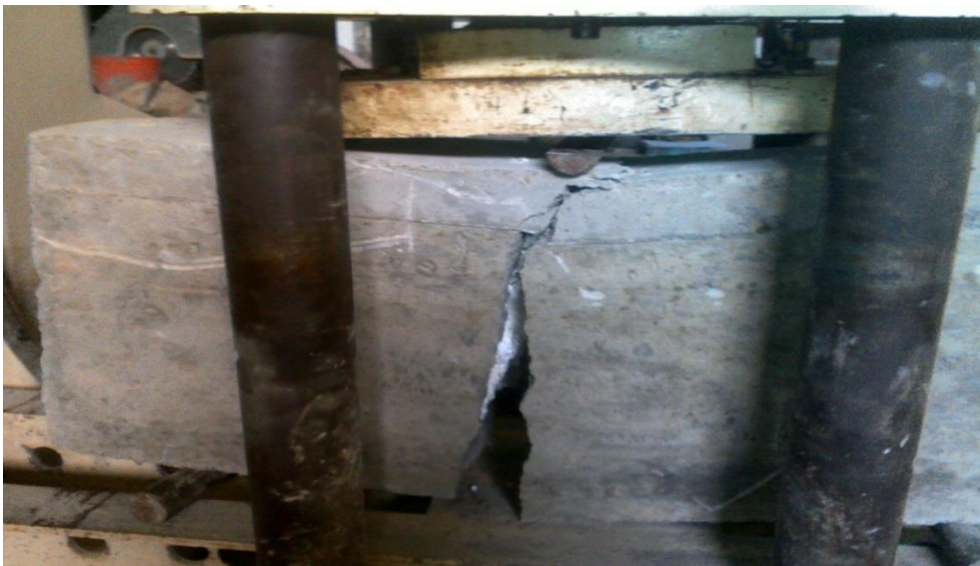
5: Flexural load setup of expanded polystyrene wall panel
